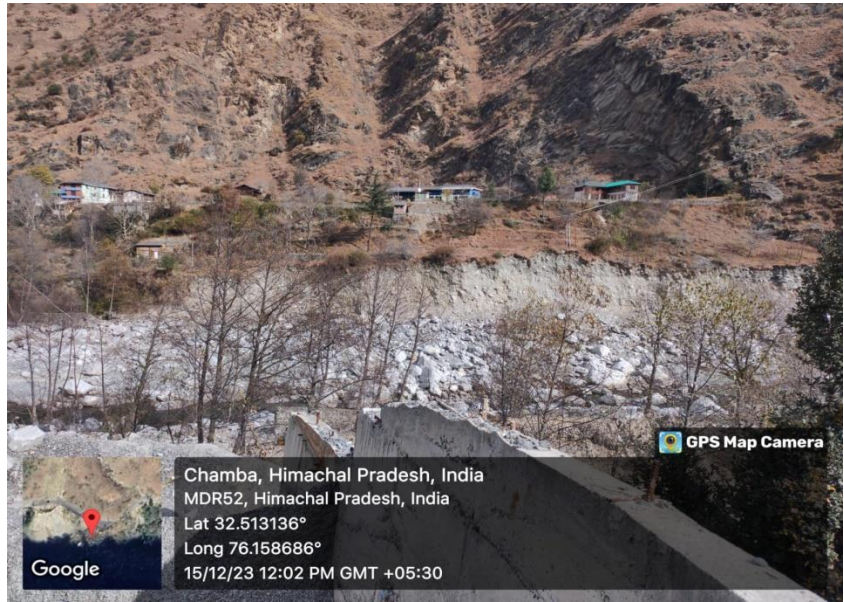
Image depicts river erosion at Village Saloon long Holi road.
